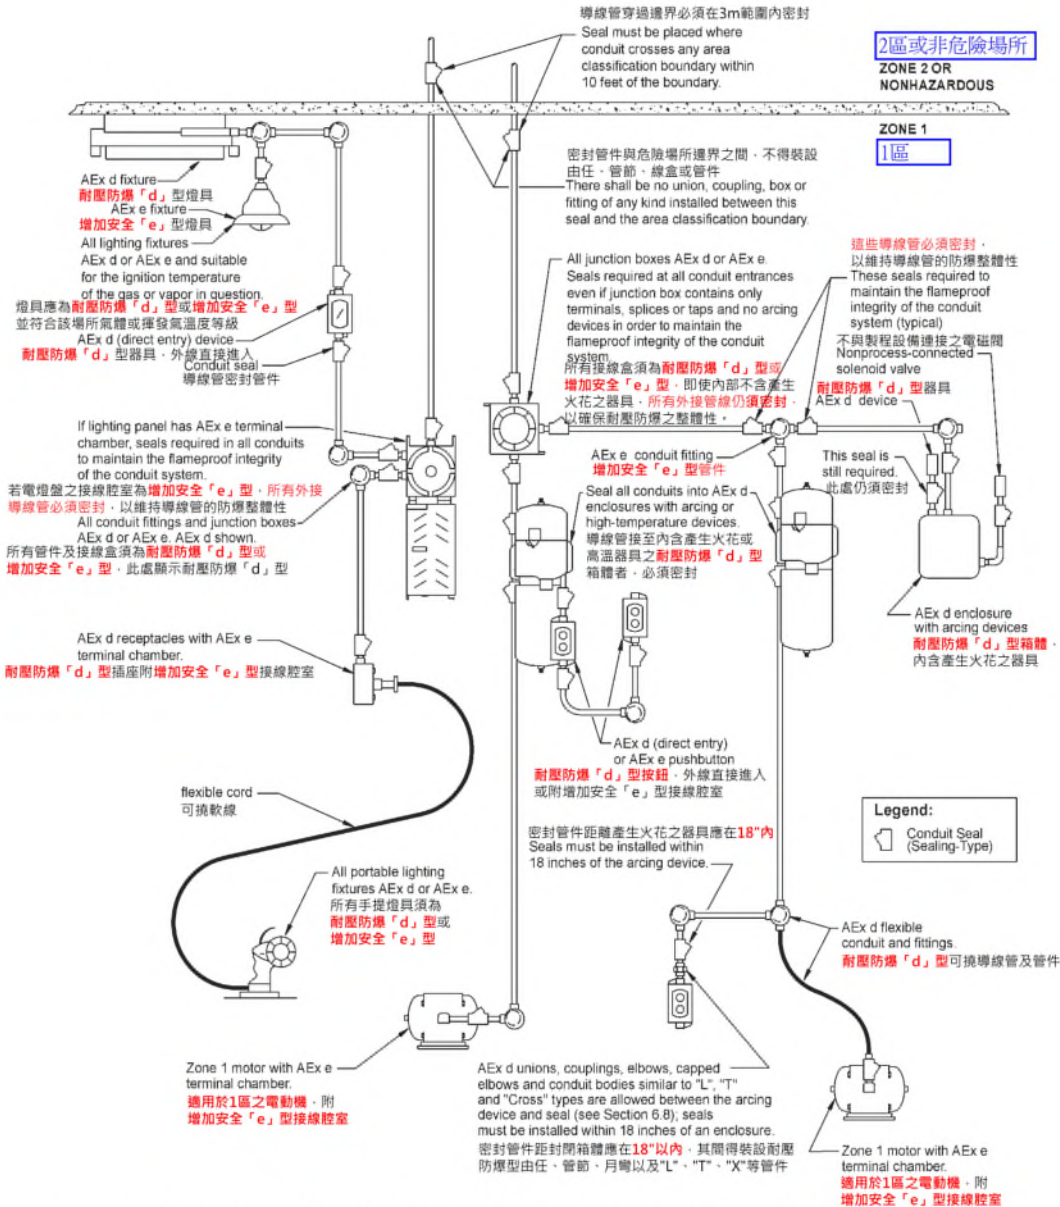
Typical Class I, Zone 1 or Zone 2 Electrical Installation Conduit System Utilizing Class I, Zone 1 Equipment and Wiring Methods
